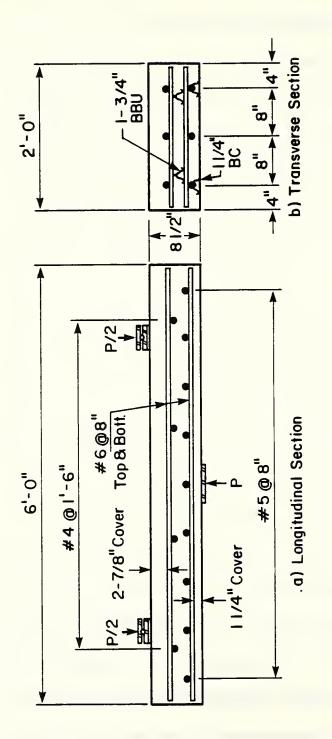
North Carolina State Slab Specimen Details (Johnston and Zia).
